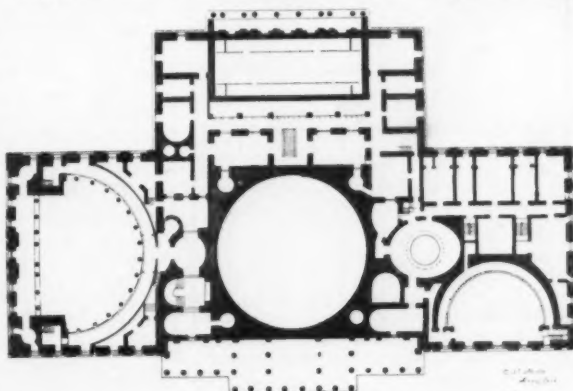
Plan of Attic Story of Capitol. From Drawing by Robert Mills.
